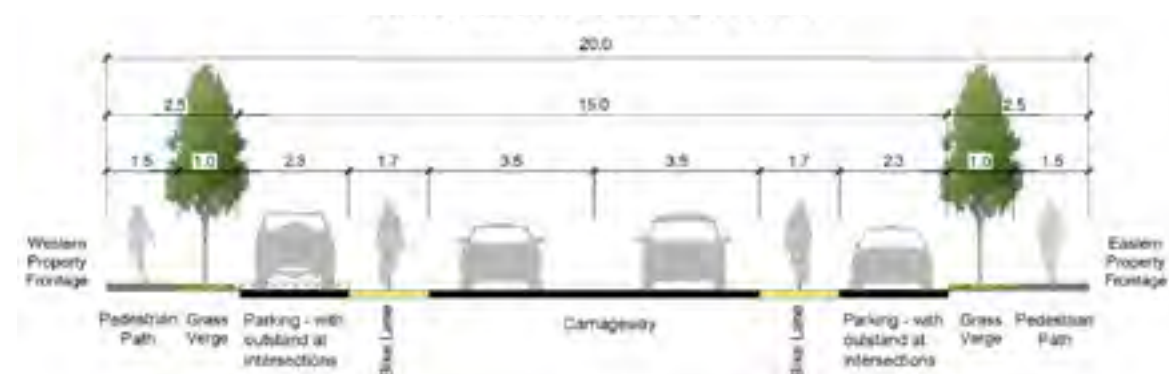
Windham Street Cross Section (Predominantly between William and Queen Streets; cross section adjacent to Hadfield Park may vary subject to the outcome of the Hadfield Park Masterplan process)
